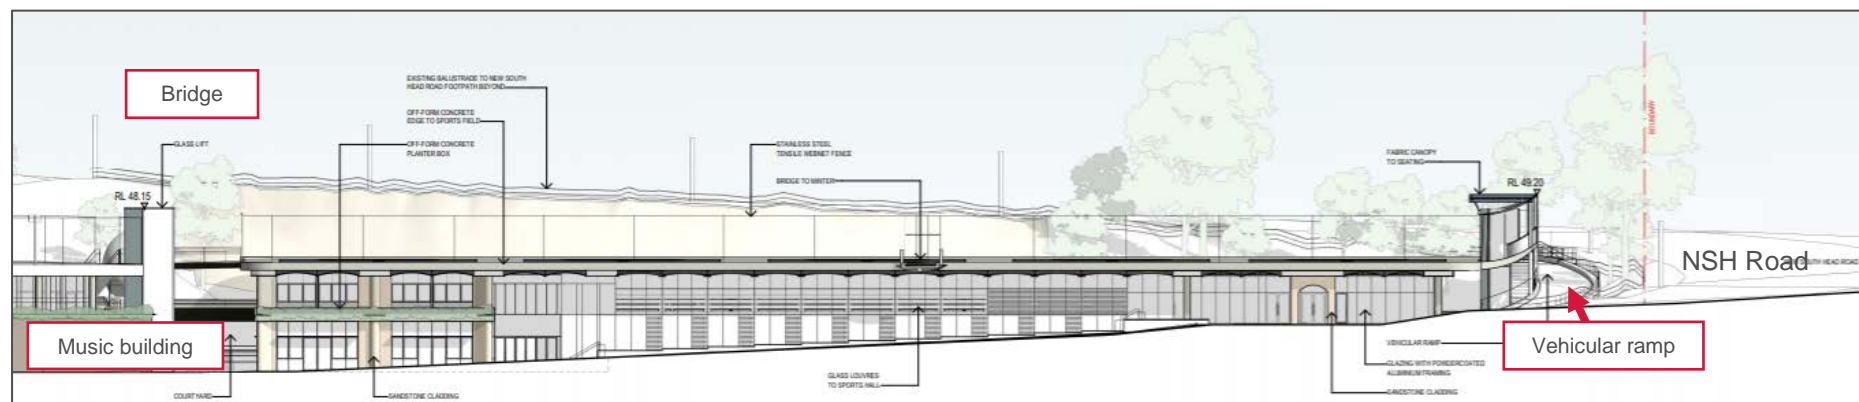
| Section through the SWSLP building, as viewed from the north (Source: Applicant's RtS 2021)
